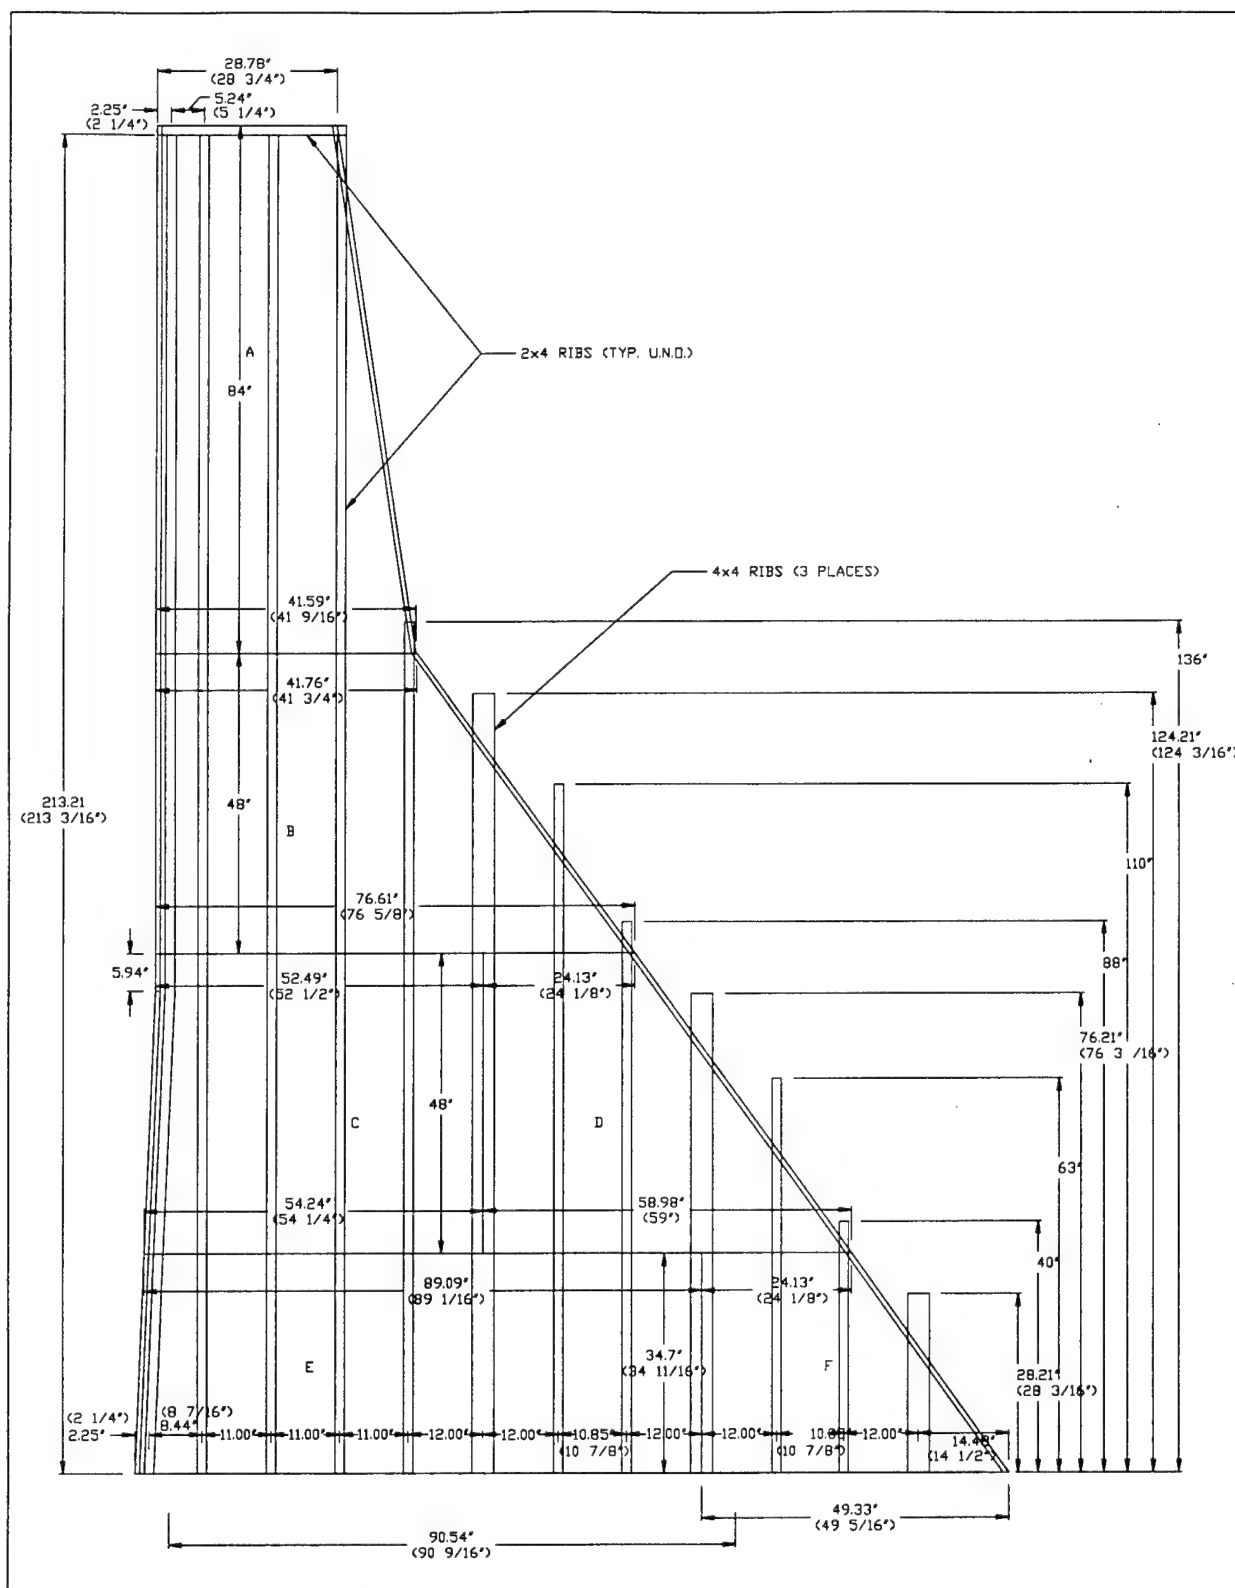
Front face drawing of model formwork showing MDO board and vertical ribs.
